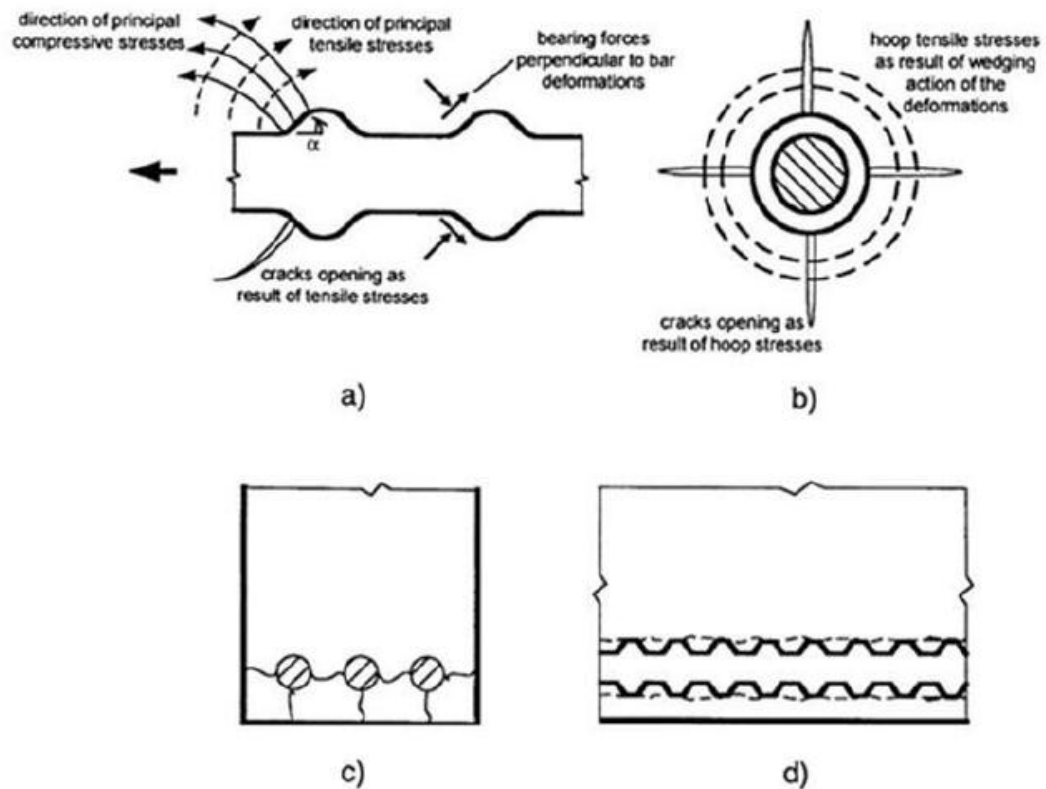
Loss of bond mechanism and cracking a) a deformed bar, b) formation of splitting cracks, c) a structural member showing splitting cracks, and d) shear crack in a member with local concrete crushing (ACI committee 408, 2003)
